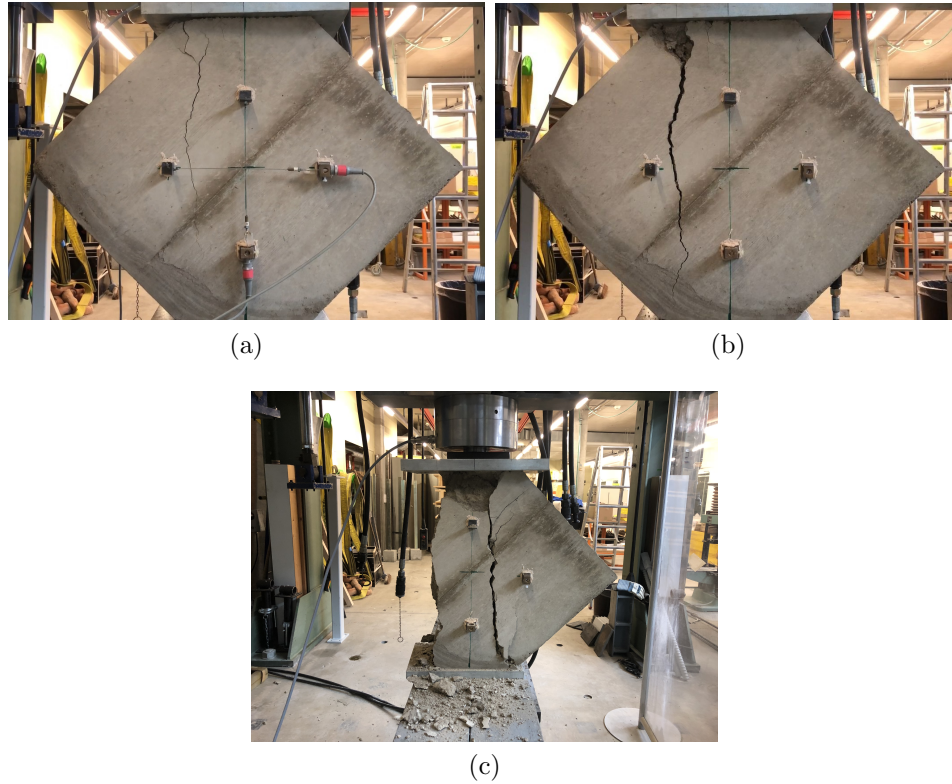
shot-earth wall tested under diagonal compression cracks pattern
